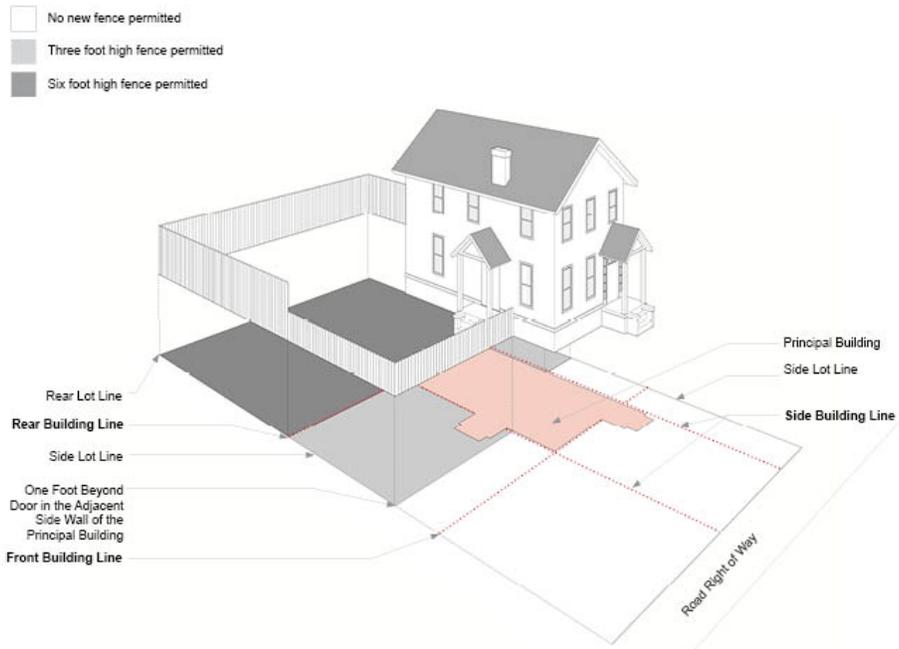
b: House on Interior Lot- Fence Behind Door in Adjacent Side Wall Option B
